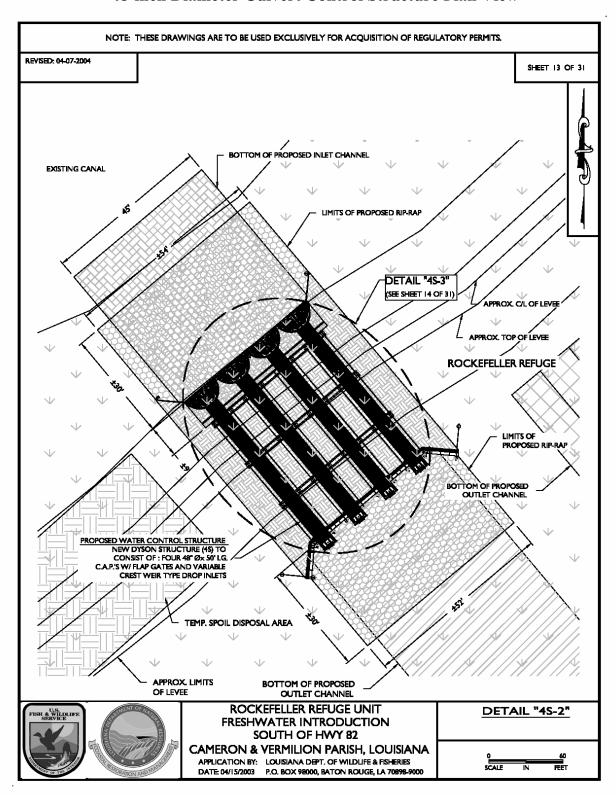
Freshwater Introduction South of LA Highway 82 Project 48-Inch Diameter Culvert Detailed Plan View
